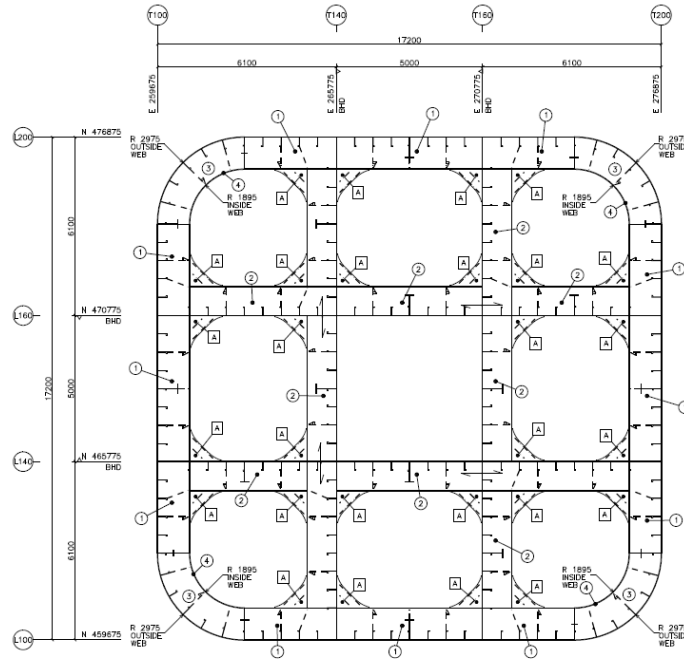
Snapshot from drawing of column cross-section (Rasmussen, 2011)
